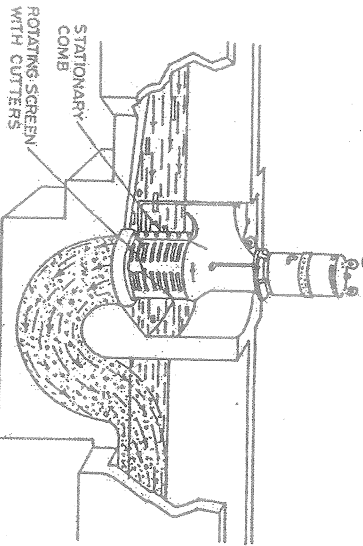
FIG. COMMINUTOR WITH ROTATING SCREEN CUTTER.
